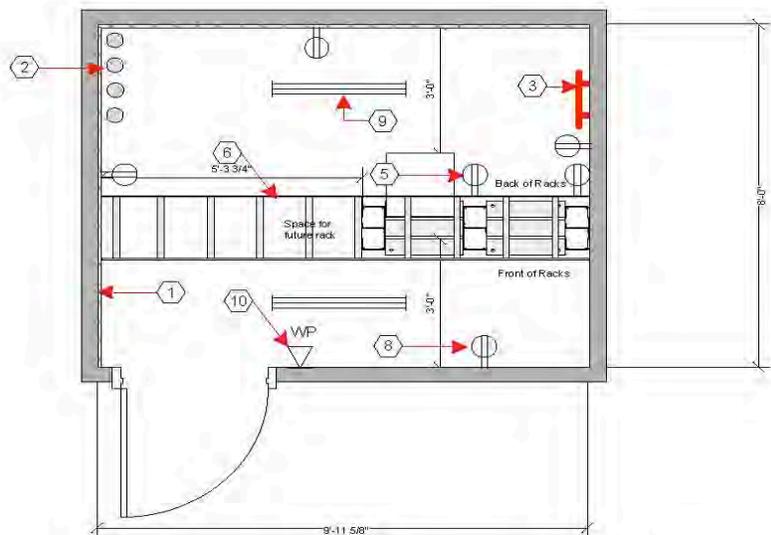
Typical Training Center Telecommunications Room (TR) Plan View
